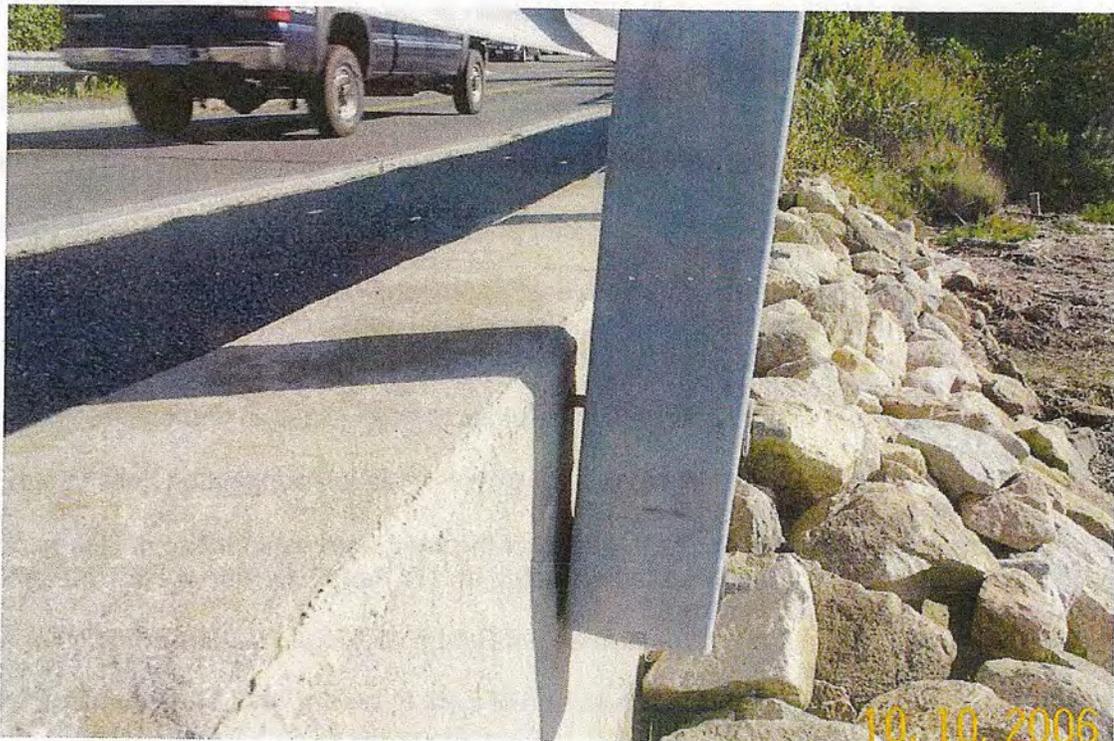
1 1/4" gap between the southeast approach guardrail post and wingwall, looking east.
